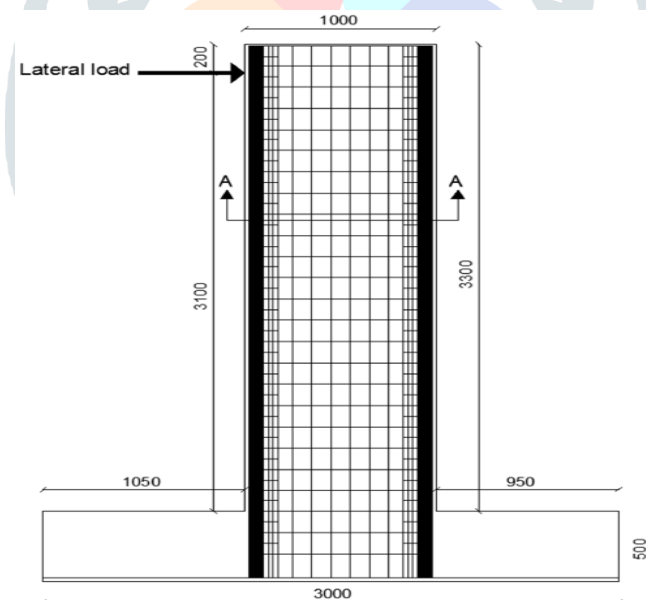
elevation view of the test setup of composite shear wall with L shaped steel plate at boundary the region.[7]
